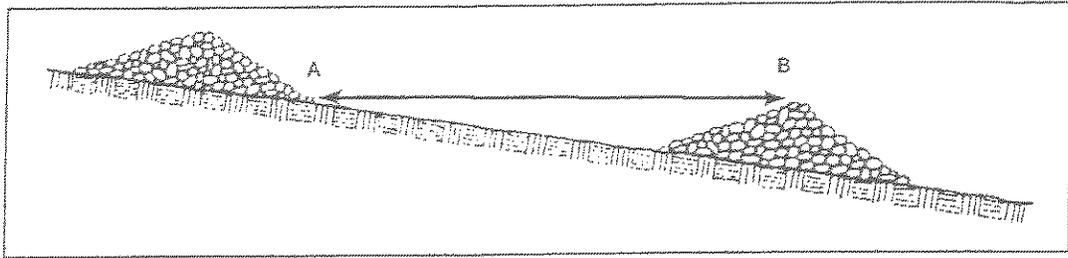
C. Space check dams in the channel so the up-stream dam toe elevation (A) and down-stream dam top elevation (B) are the same.
